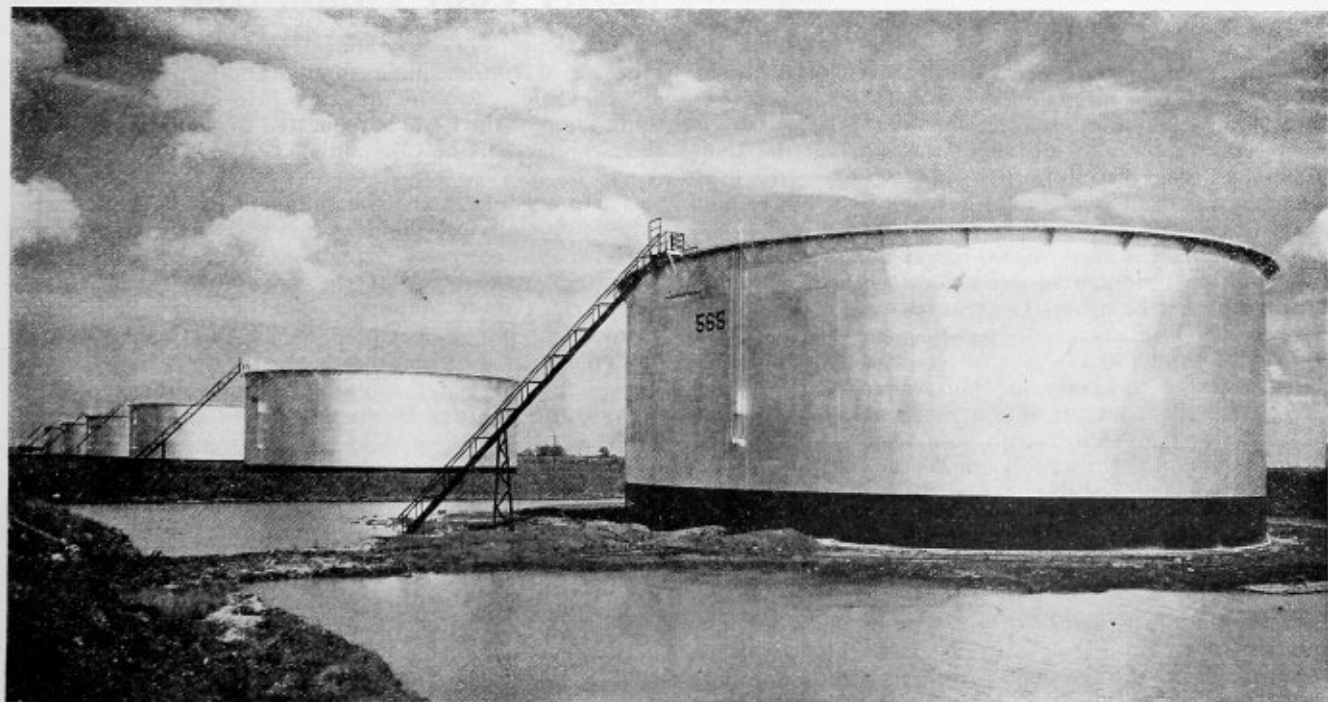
Seven arc-welded, 93,000 barrel tanks at Houston, Texas
